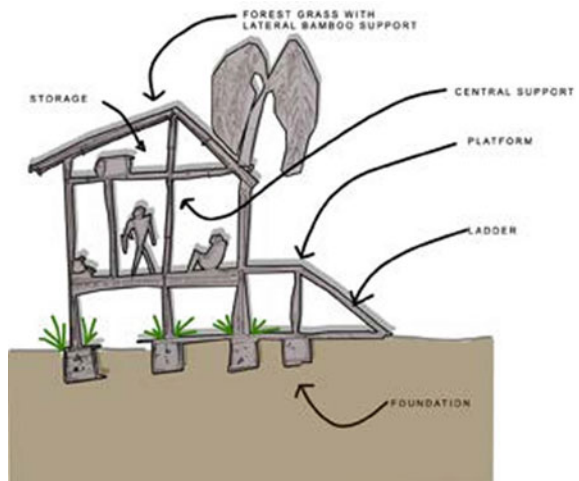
Typical plan of traditional house of Majuli Island. *Source* Authors
